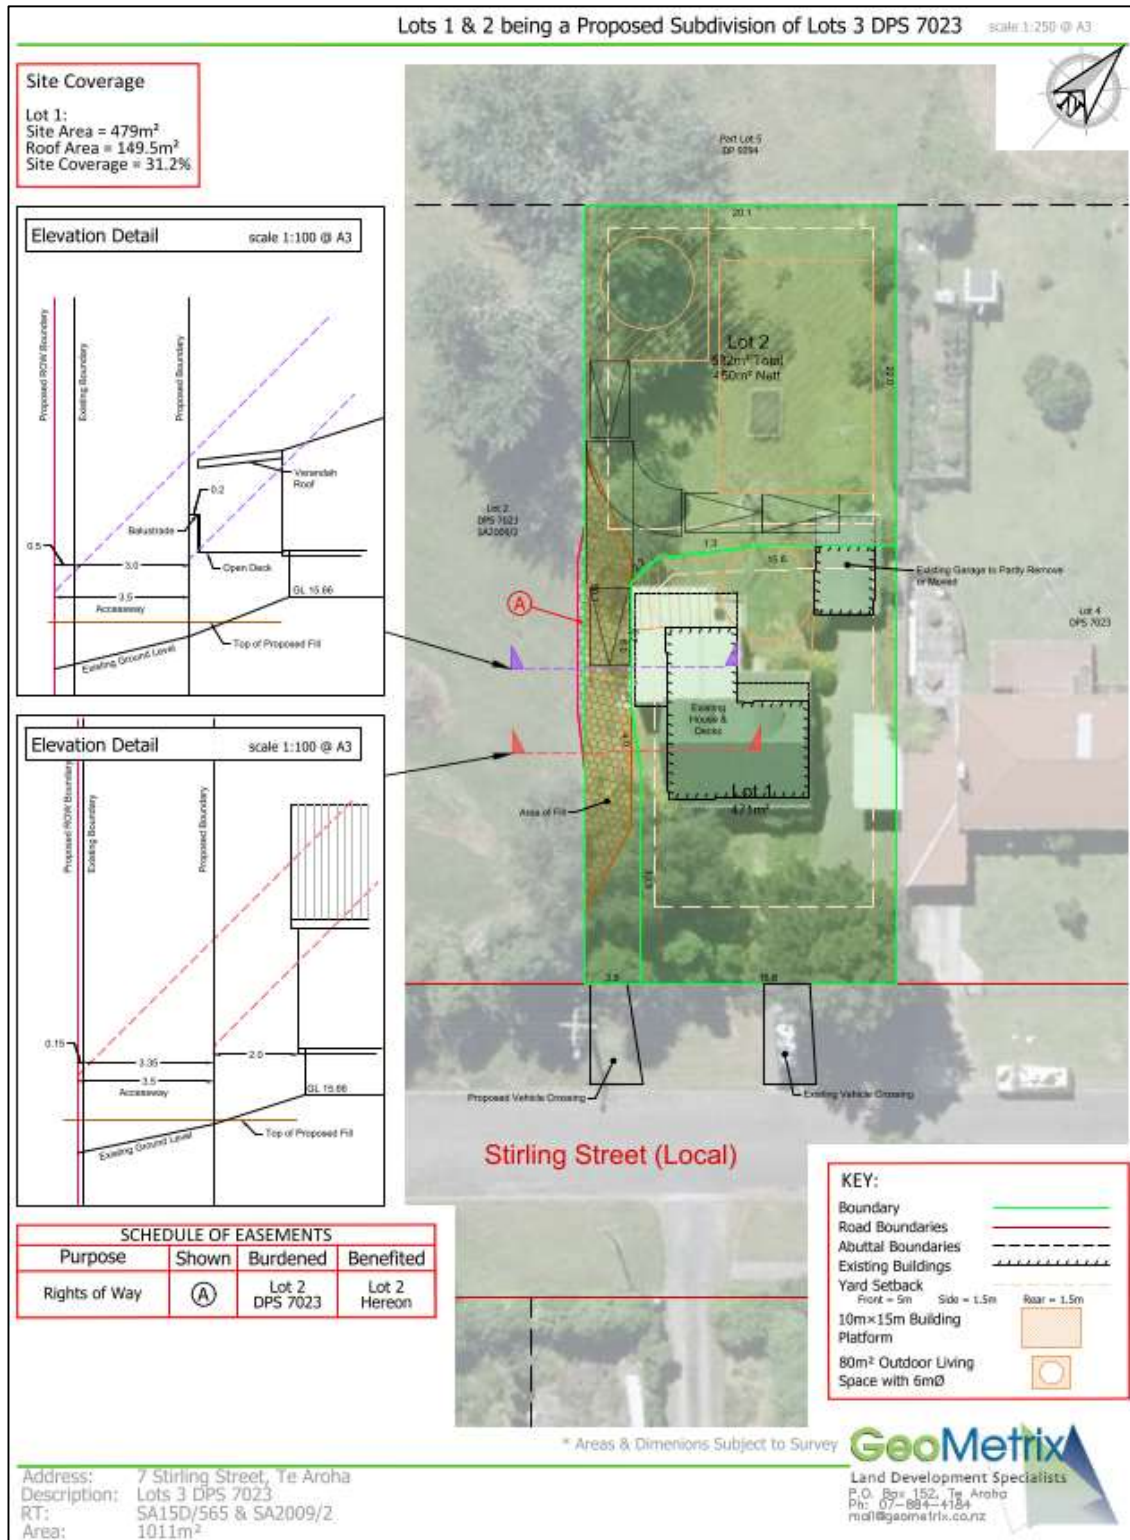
Scheme plan showing the size and layout of the proposed lots (Not to Scale).
